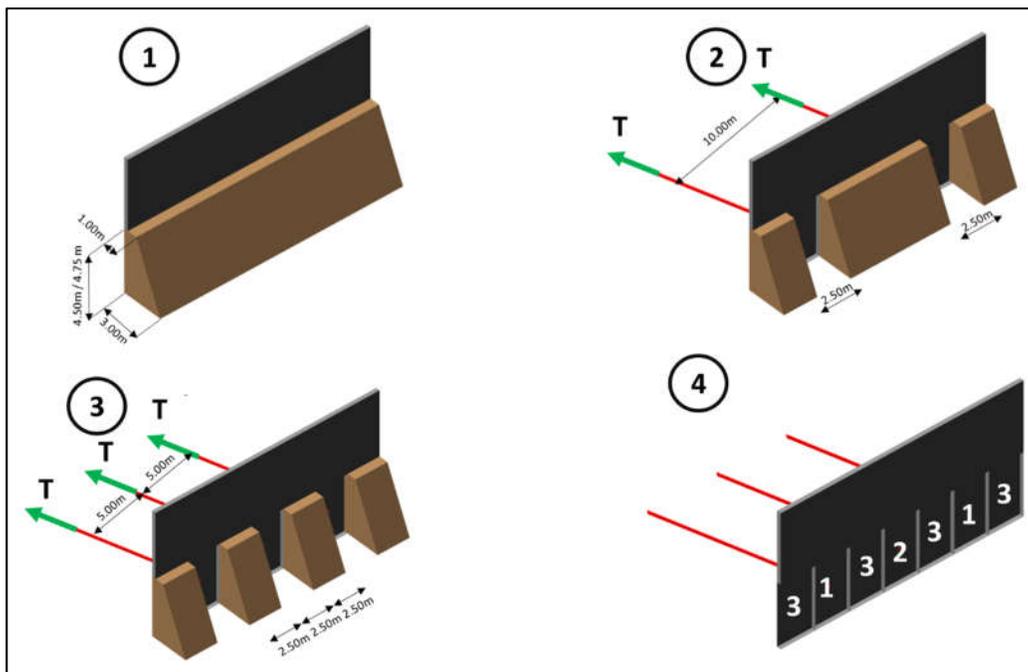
Typical construction procedures for large excavations in Buenos Aires. Ideal sketch.
